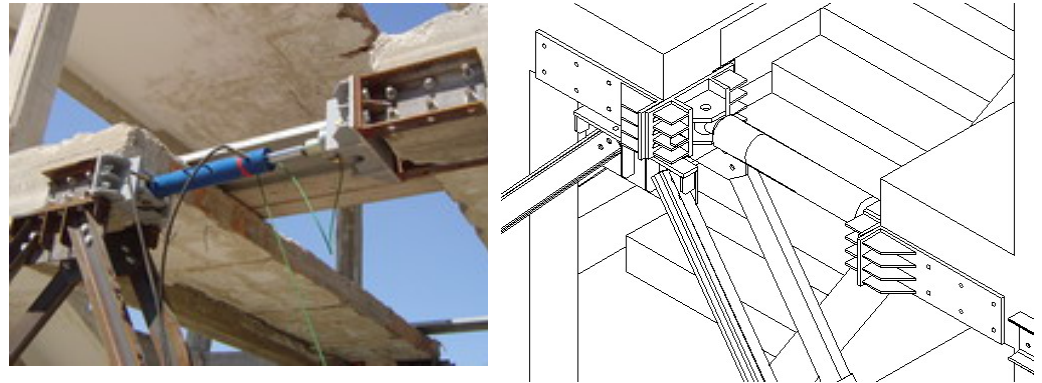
Application of pin-joined hydraulic jacks to the sub-structure
